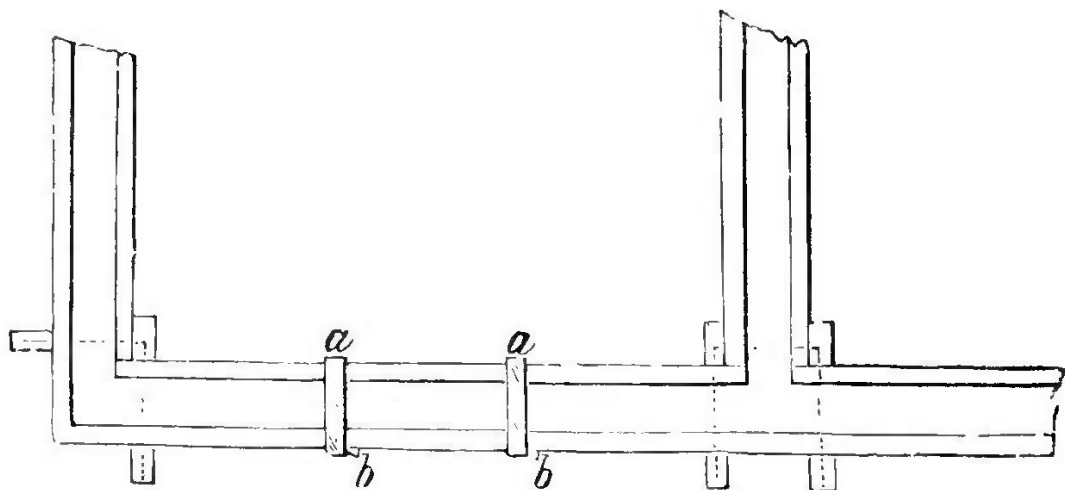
ARRANGEMENT OF THE PLANKS.
